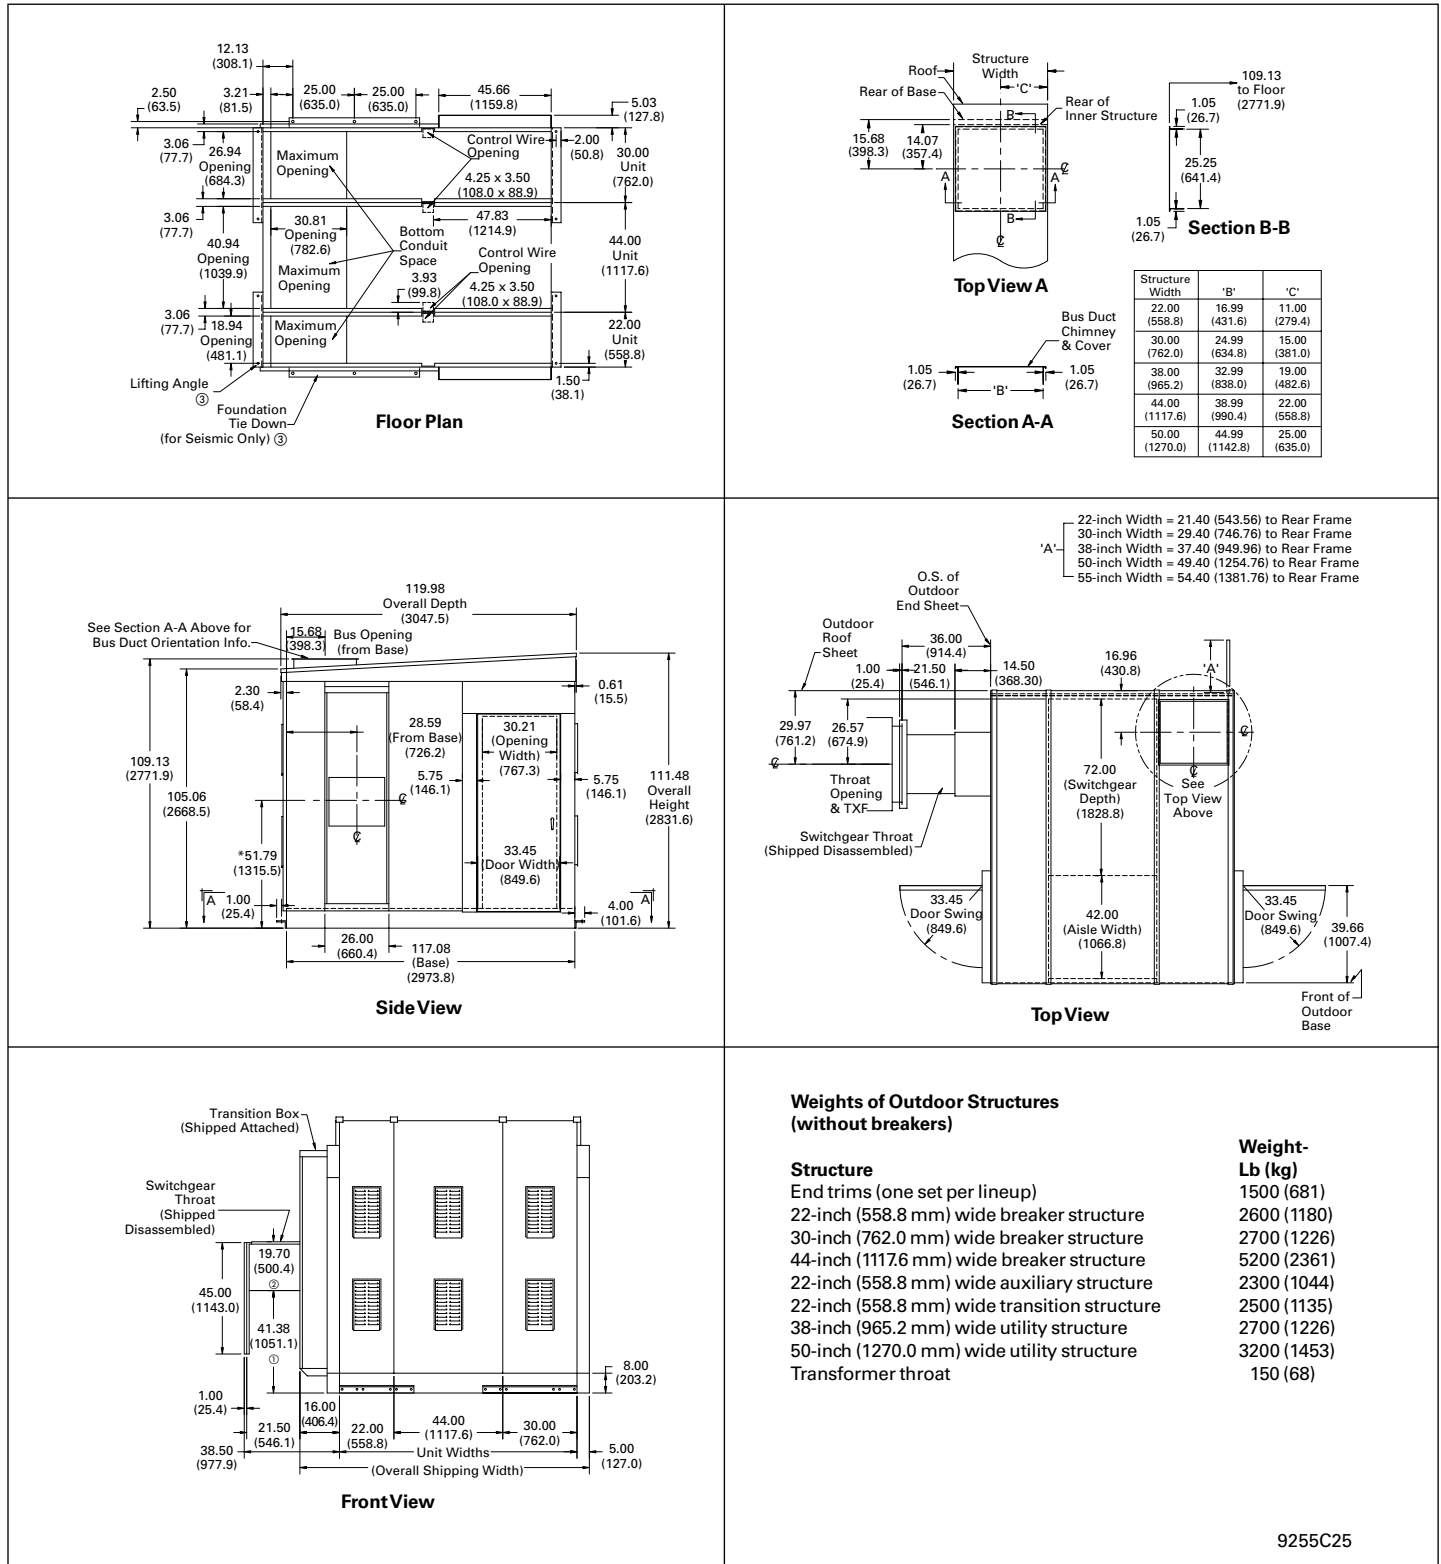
Outdoor Walk-in Enclosure Magnum DS Switchgear and Magnum SB Switchboards—Dimensions in Inches (mm)
